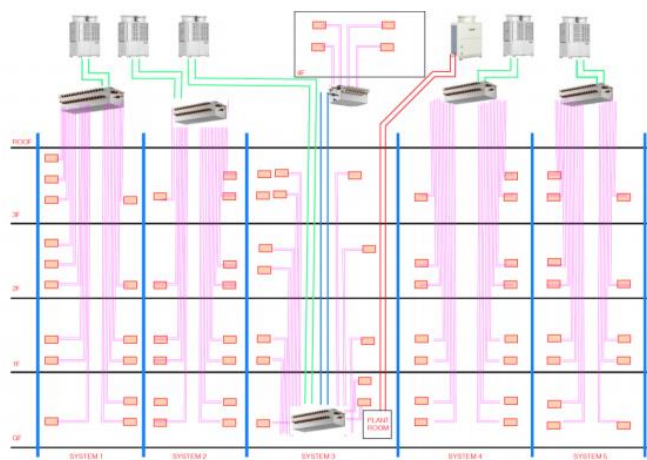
The number of pipes diminishes down through the building. Additional risers away from the existing would require additional structural openings to be formed at roof level and throughout the building.
